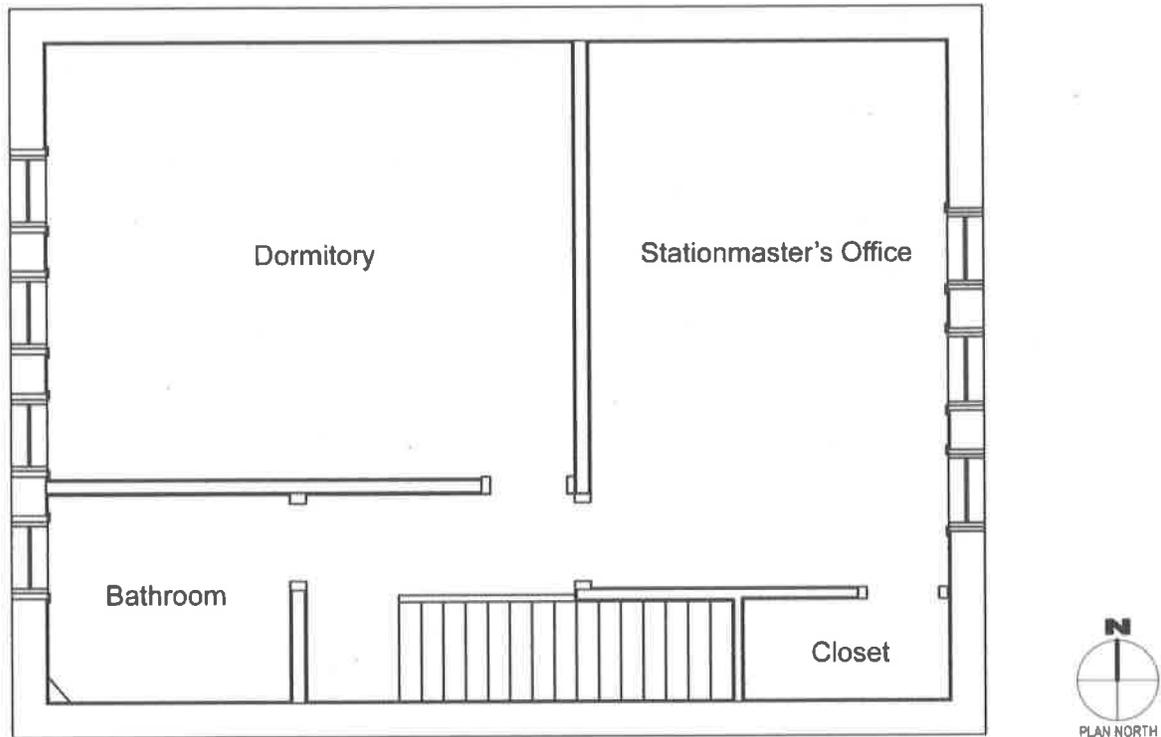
Second Floor Plan of Keokuk Union Depot, 2011,
